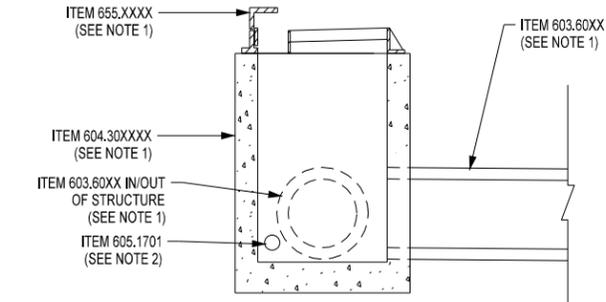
DETAIL H - BACKFILL OF STRUCTURE ON ONE SIDE WITH ITEM 623.12
